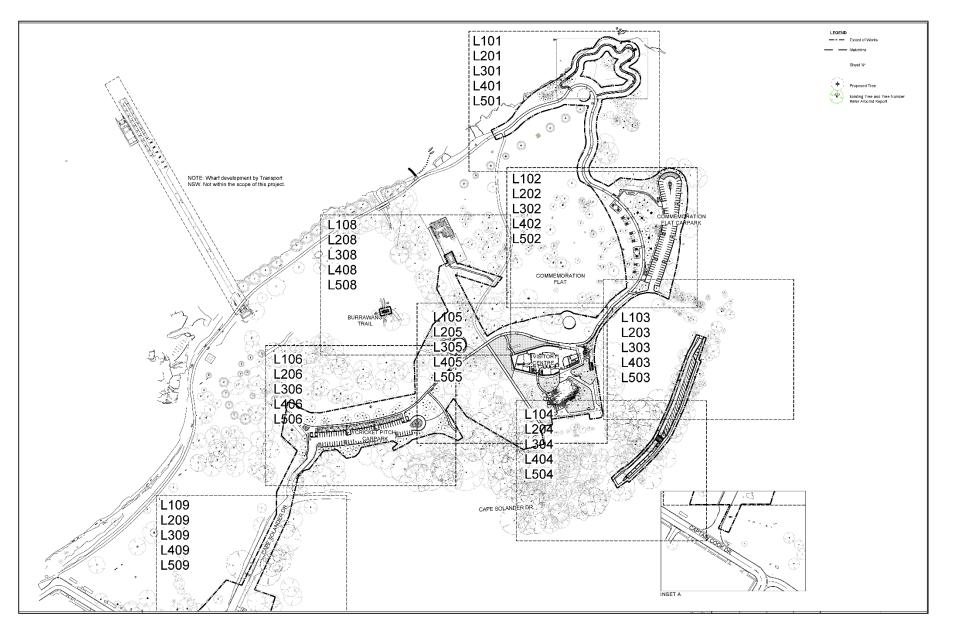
Kamay Master Plan Stage 1 (Taylor Cullity Lethlean 24/03/2023)
